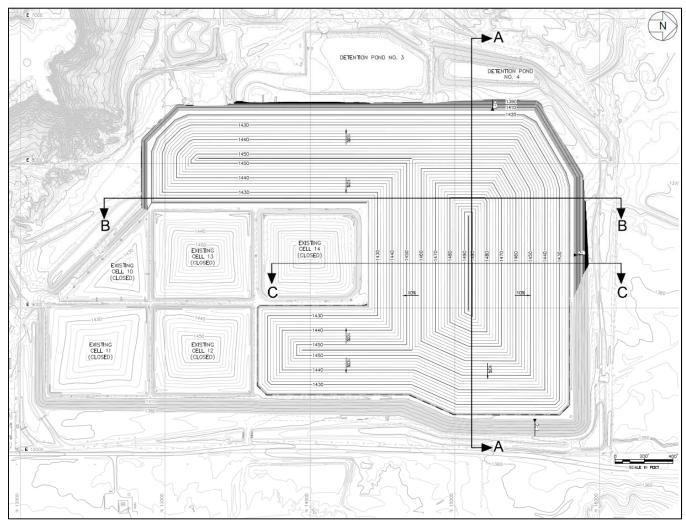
Locations of the Stability Cross Sections in Relation to Overall Top of Waste Grading Plan.
